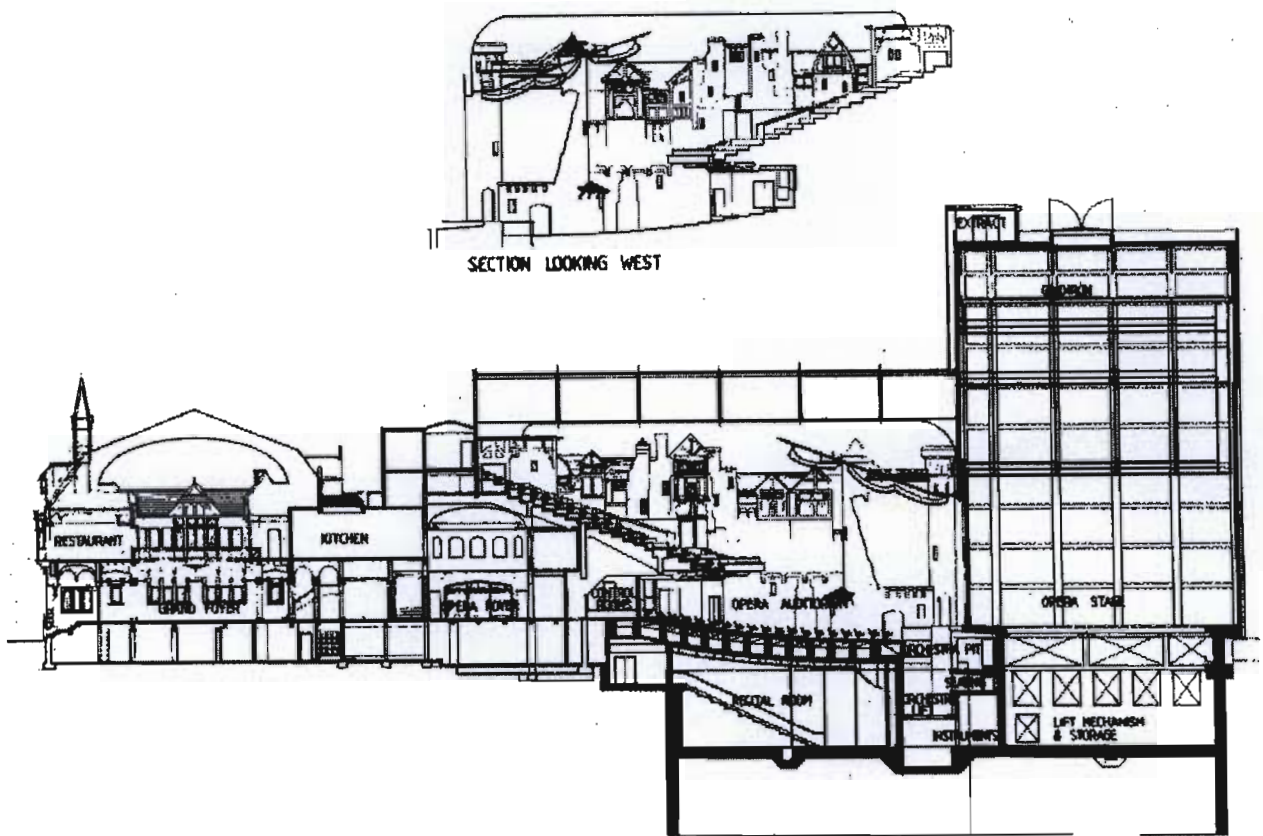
Playhouse Longitudinal Section (Peters, 1983)
